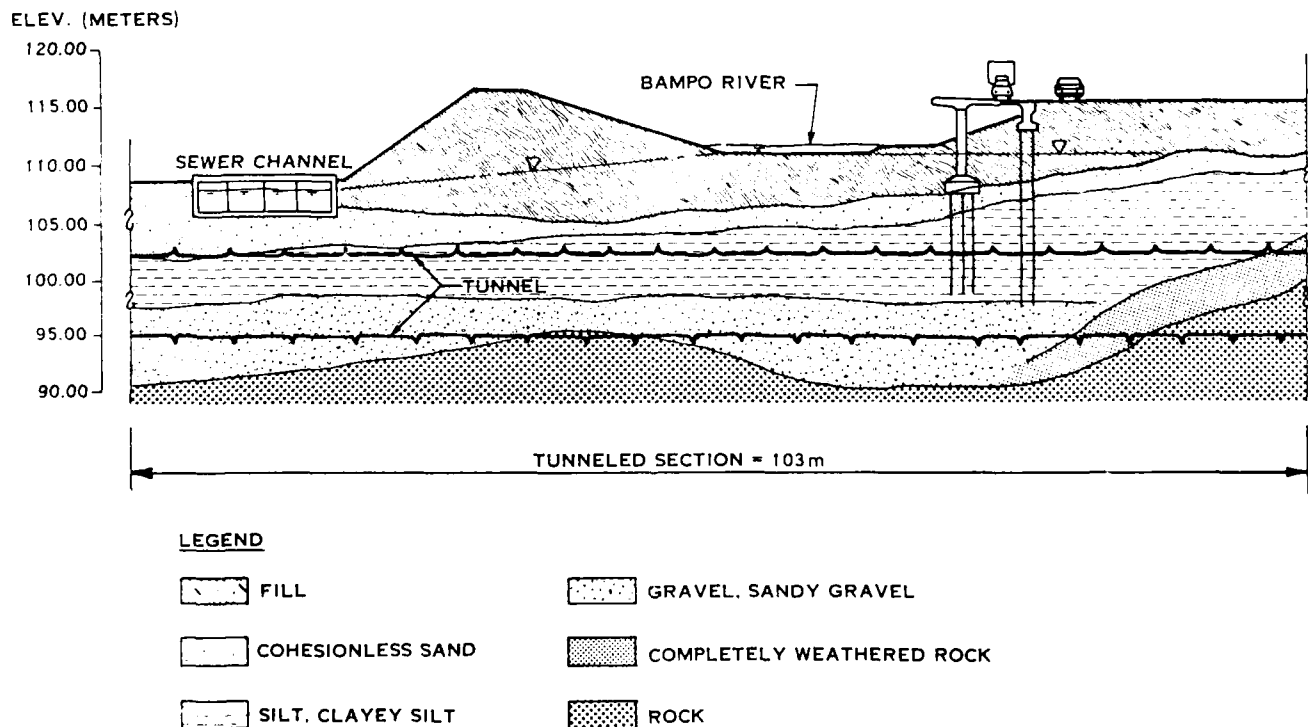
SECTION 330-3 SUBSURFACE PROFILE.
